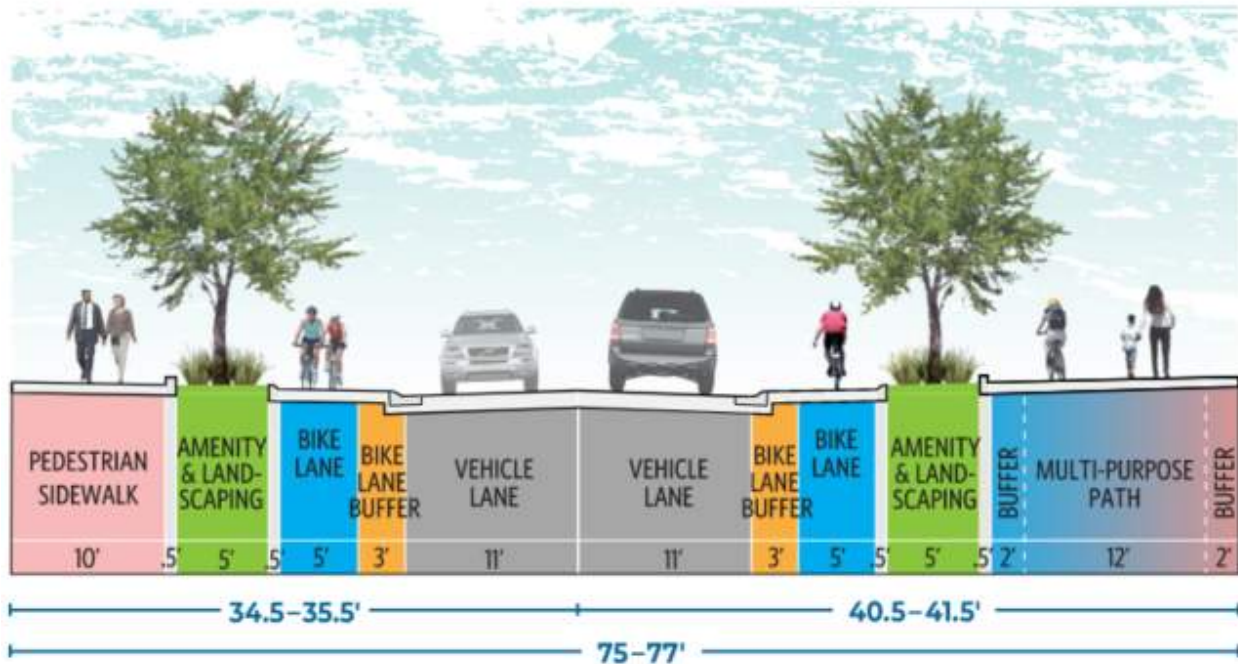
Bike Lanes Adjacent to Road, Separated Vertically from Roadway & Multi-Purpose Path – South Side
